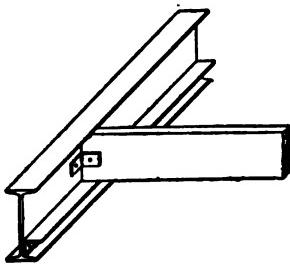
Framing Joists to I Beam with Shelf-Angle.
